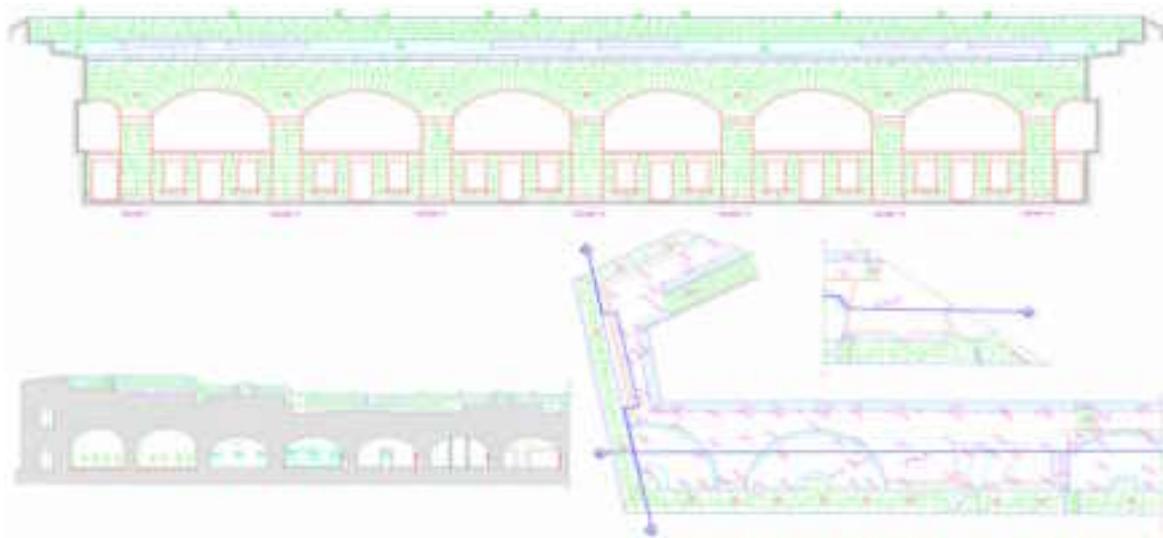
Examples of Heritage Record (Elevation, section and roof plan)
